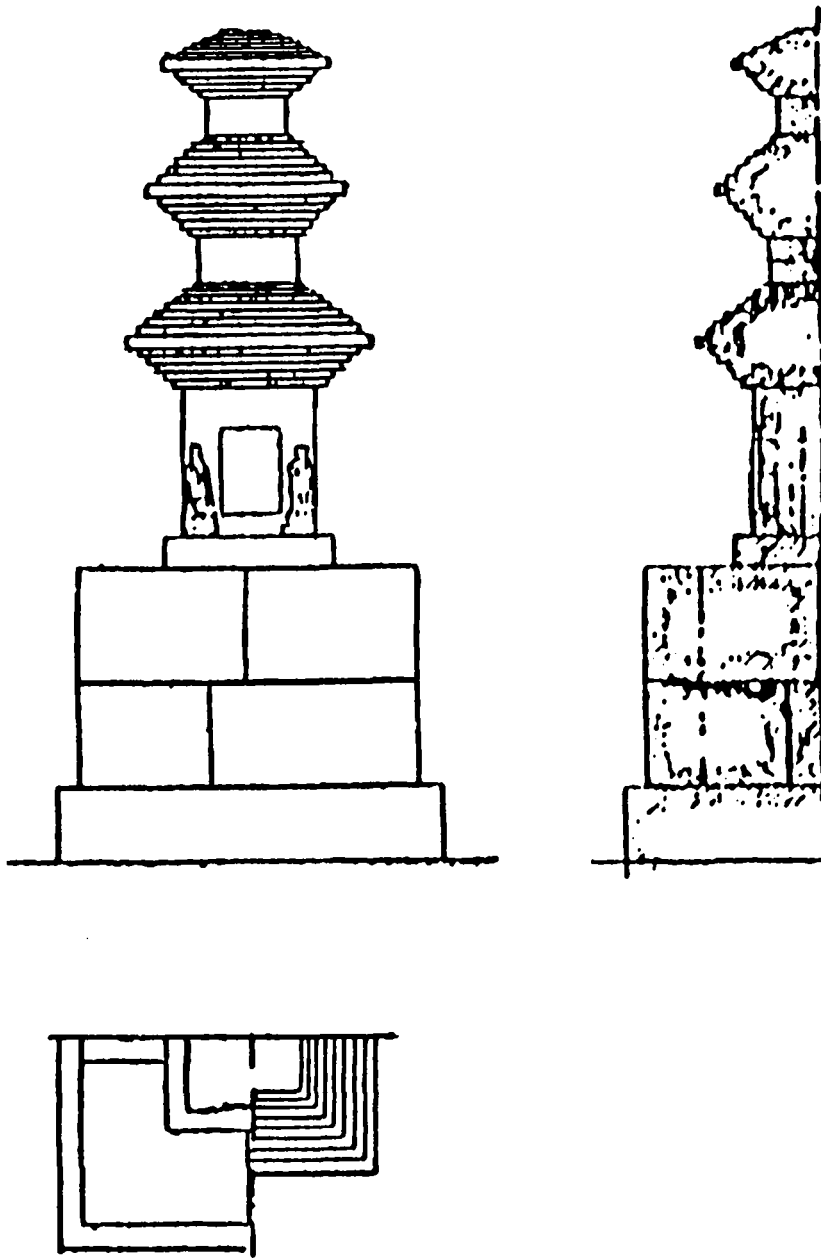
Two partial plans, elevation and partial section of the stone pagoda at Sŏ-ak-dong
